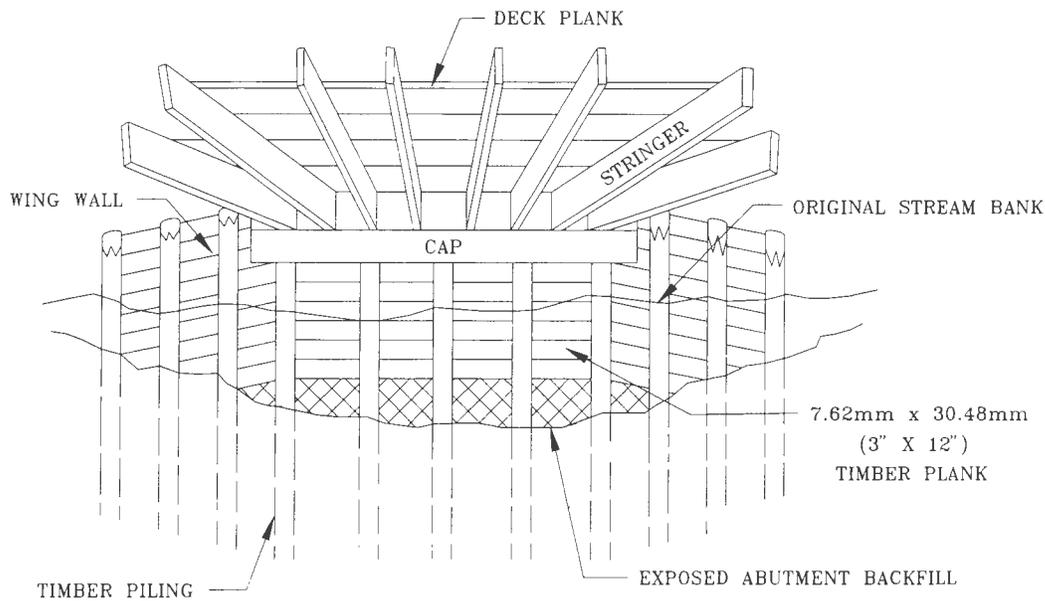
Typical timber bridge abutment with streambank erosion.
